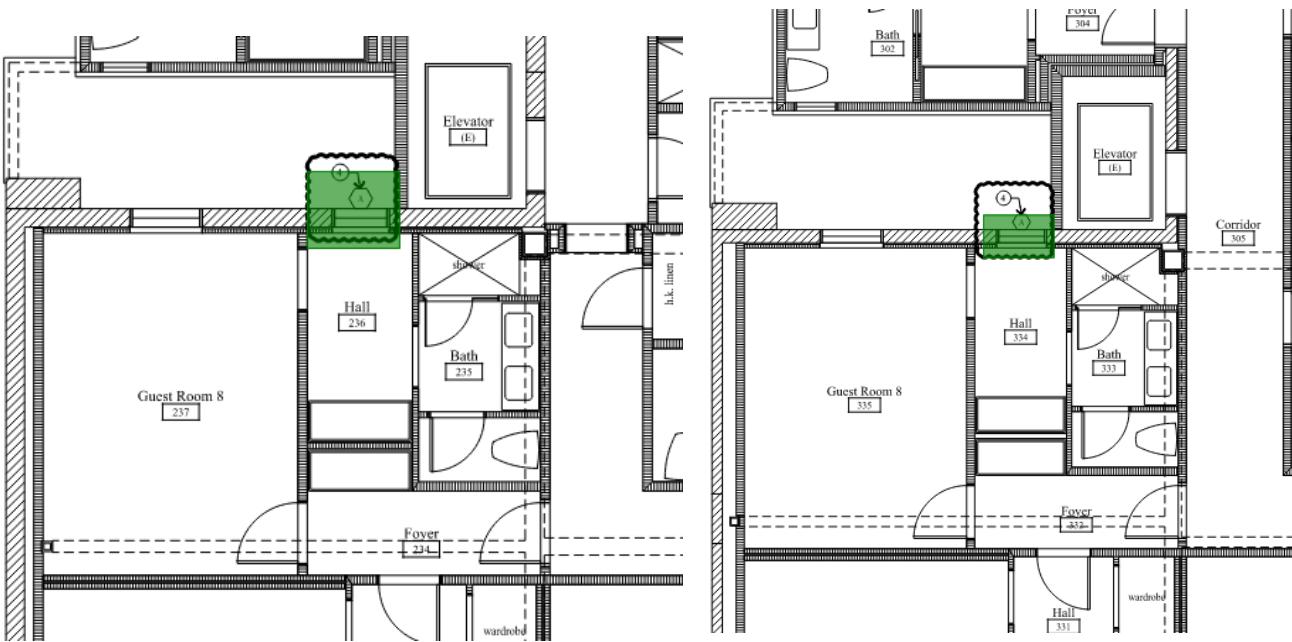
Proposed location of restored window opening on the south façade on the second (left) and third (right) floor, highlighted in green by Staff.
